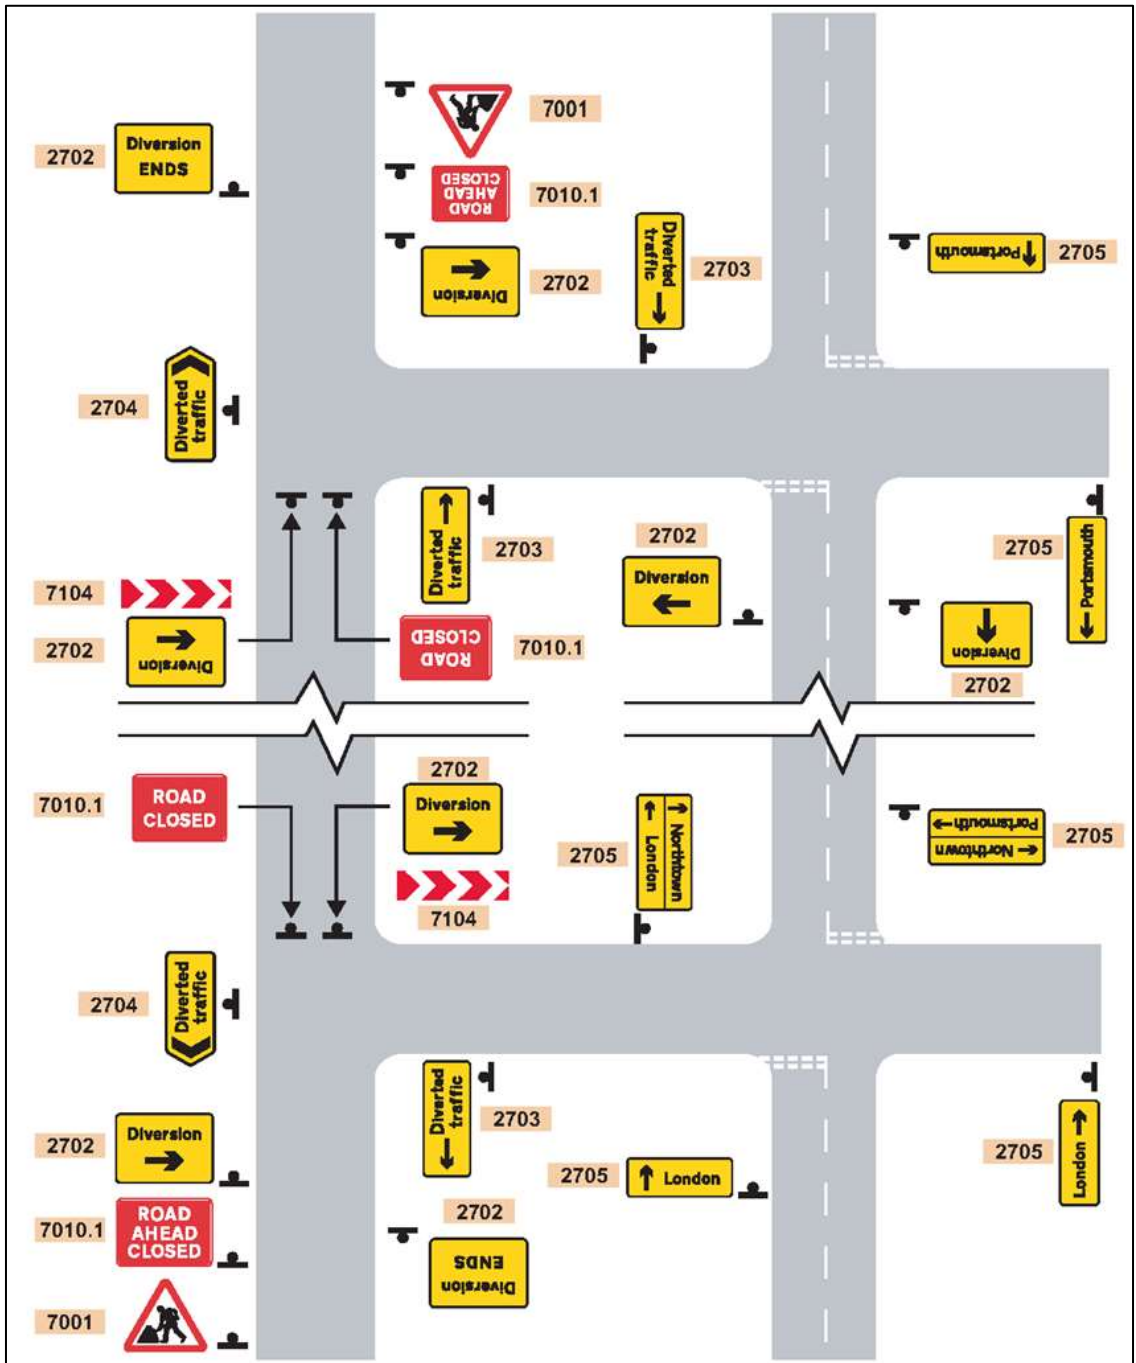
Layout of Signs for Road Works on Single Carriageway Roads with Diversions
